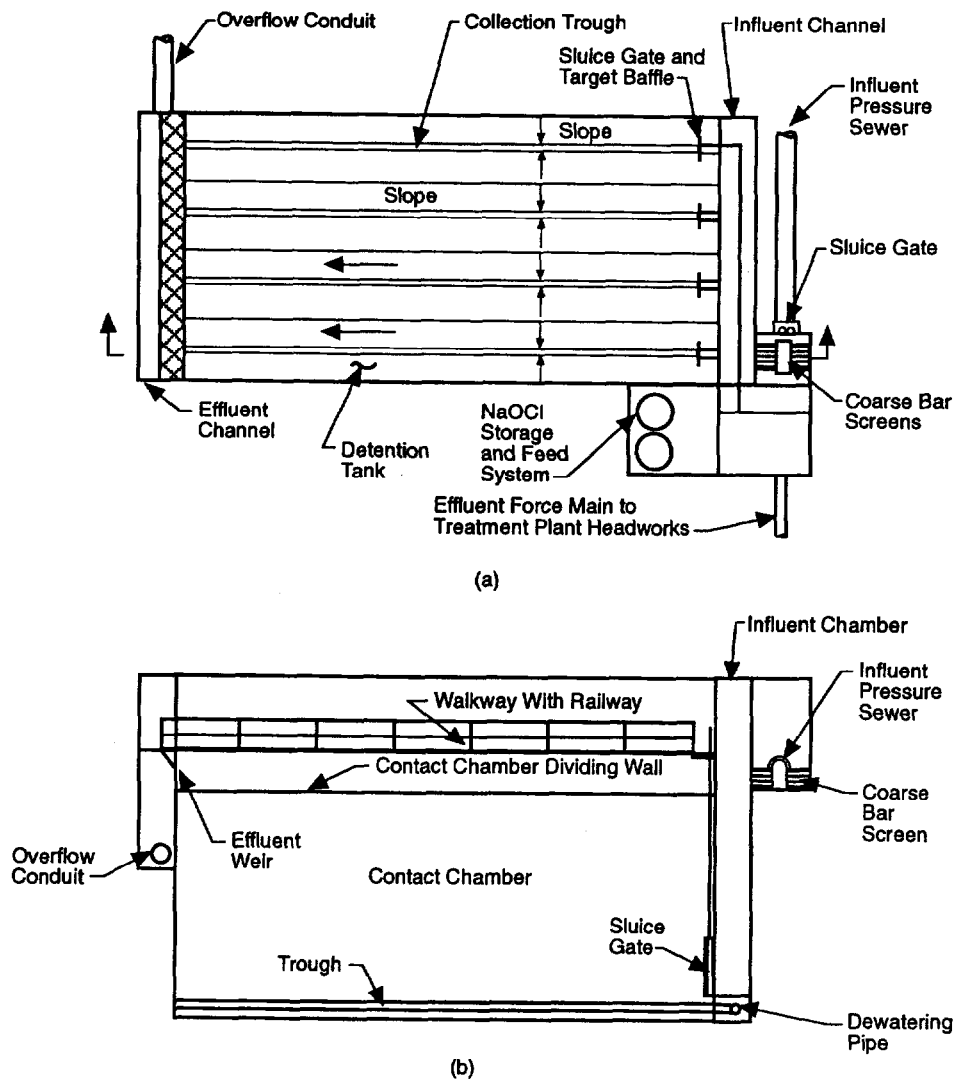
Plan and profile for a typical rectangular storage/sedimentation facility (Metcalf & Eddy, Inc., 1991a).
